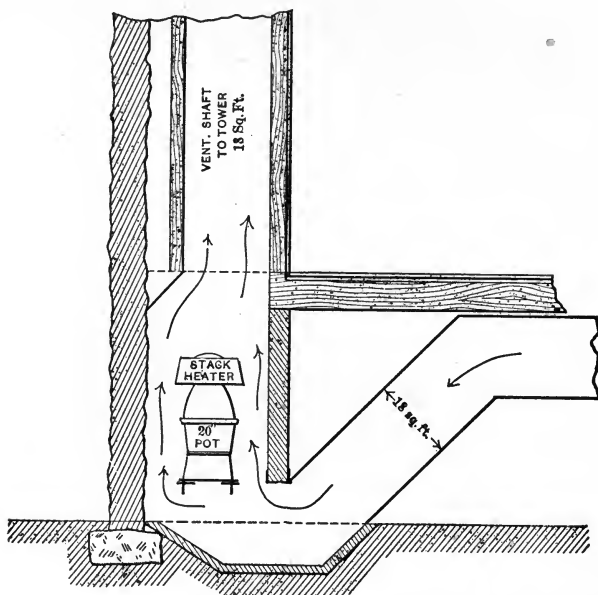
Section at A A, Showing Arrangement of Stack Heater
